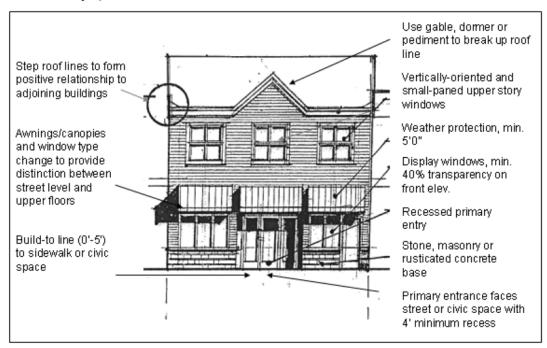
A: Typical Building Elements in Historic Roadside Commercial (Roadside Building Style)
